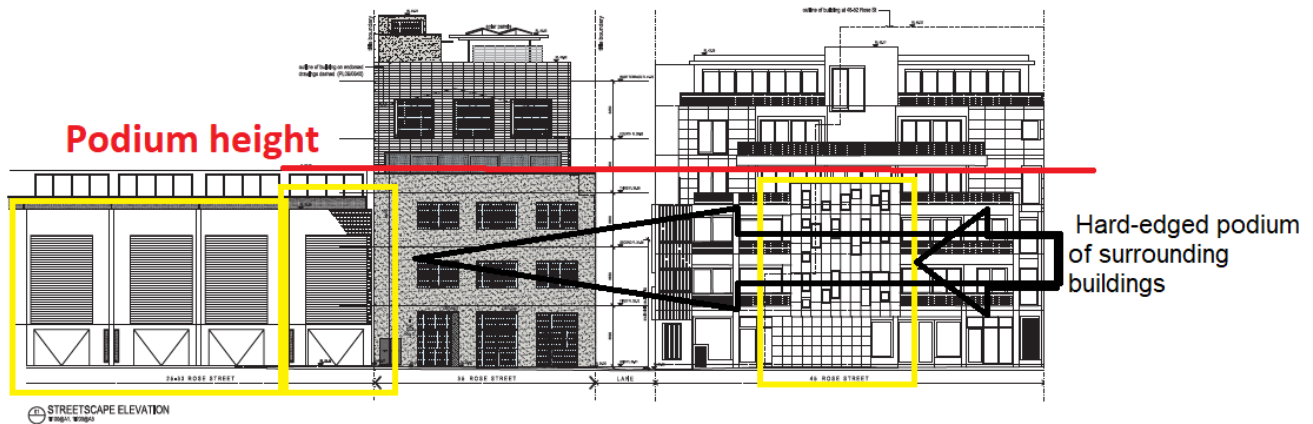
Streetscape elevation to Rose Street, comparing the adopted podium height to those surrounding.
